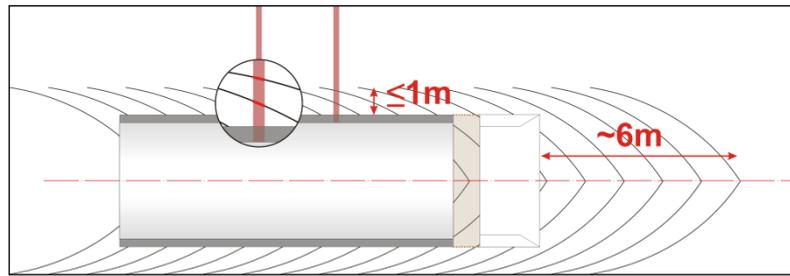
Vertical cross-section of the observed fractures around the Connecting gallery; their radial extent is up to 1 m and the fractures originate about 6 m ahead of the excavation face.
